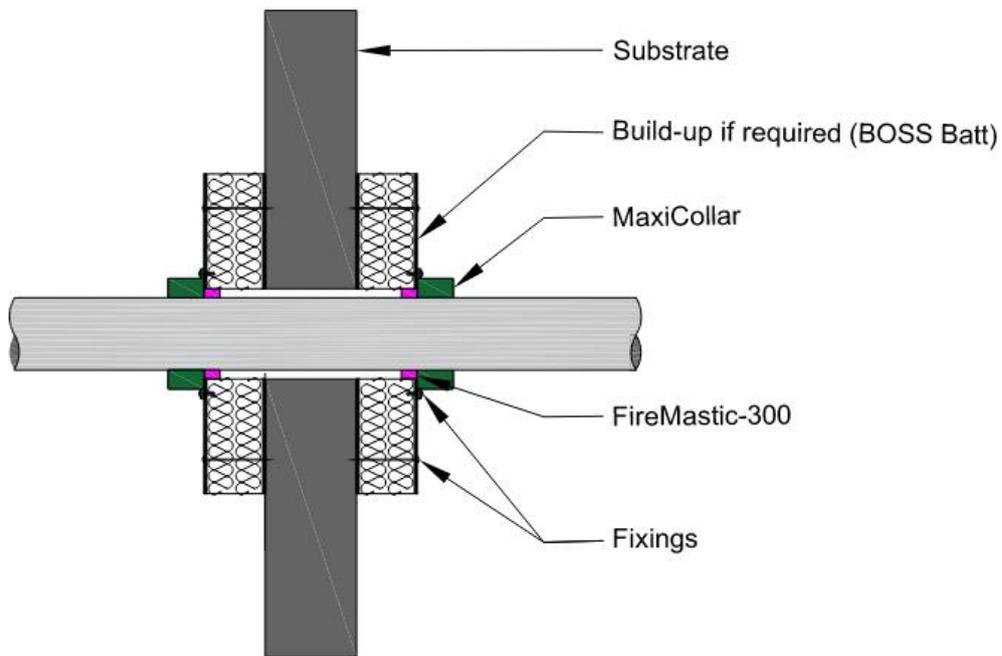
Typical installation of pipes fitted perpendicular to wall with two layers of BOSS Batts pattress-fitted in aperture and BOSS MaxiCollar™ on both faces
